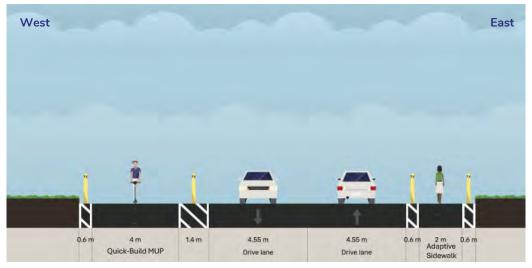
Recommended Northern 4th Street Cross-Section Between B Avenue and A Avenue
